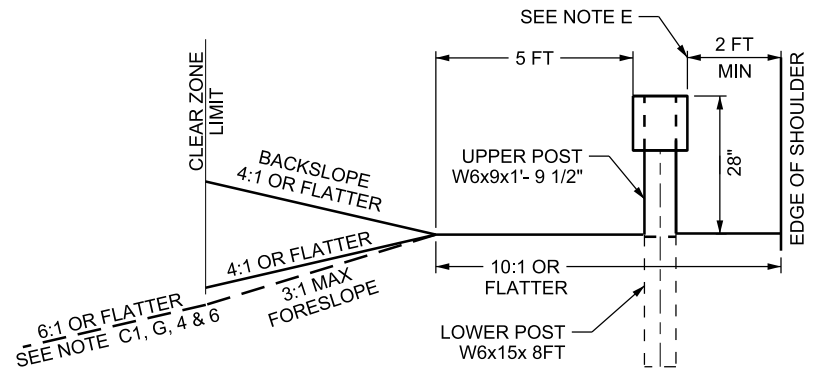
DETAIL WHEN SYSTEM IS INSTALLED WITH CONSTANT SLOPE BARRIER
